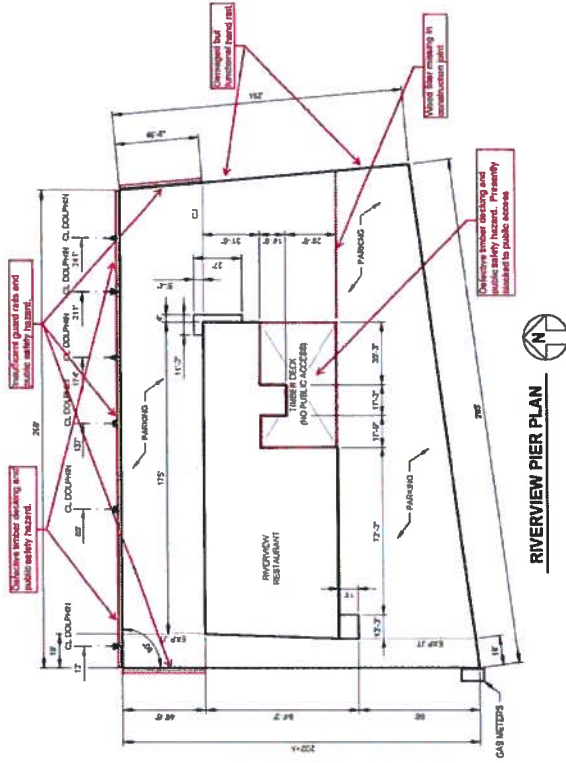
Downtown Riverview Pier Framing Plan and Damage Locations
